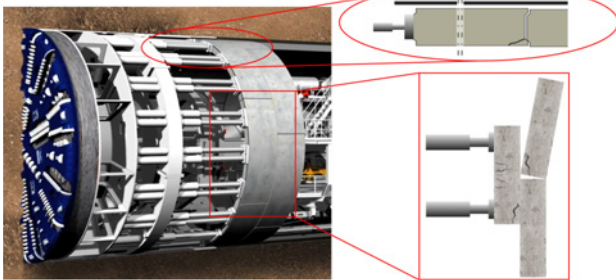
Possible damage patterns in tunnel lining segments during the excavation process
